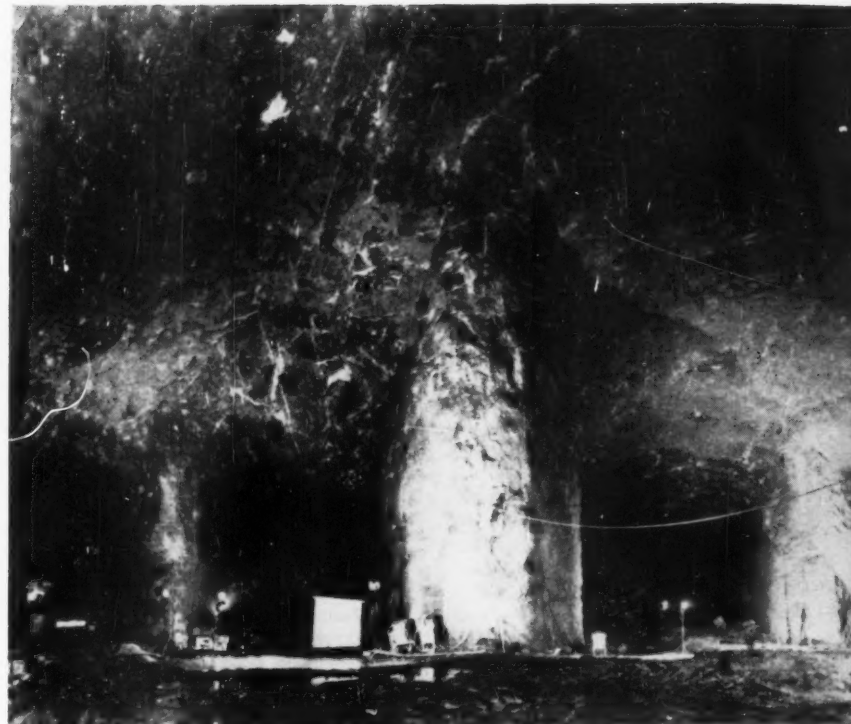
Stornorrfors tailrace tunnel is being excavated in three sections—top heading with cross-sectional area of 1,730 sq ft; first bench of 1,300 sq ft; and second bench of about 1,160 sq ft.
